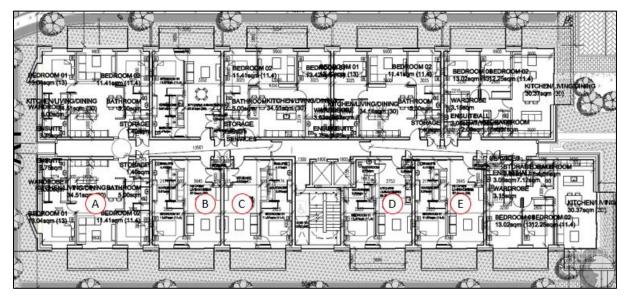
Block A2 – Fourth Floor Assessed Rooms
